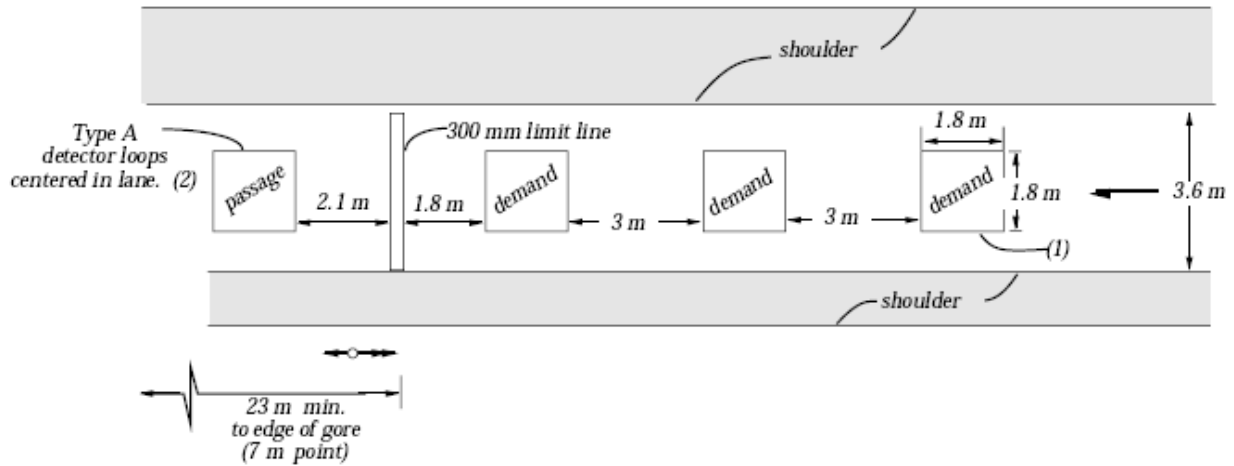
Typical Passage and Demand Detector Layout (One Lane Ramp)²⁸
